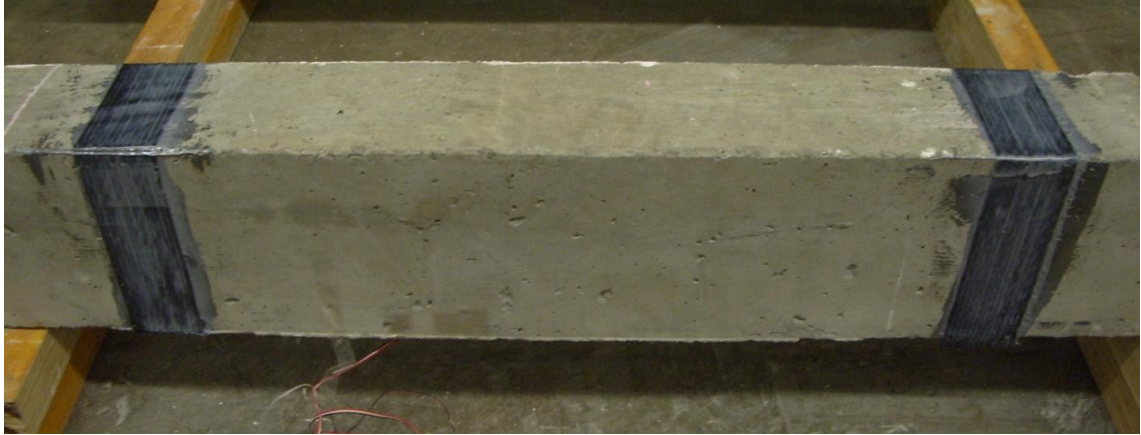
Example of Sikwrap as U-Jacket shear reinforcement
